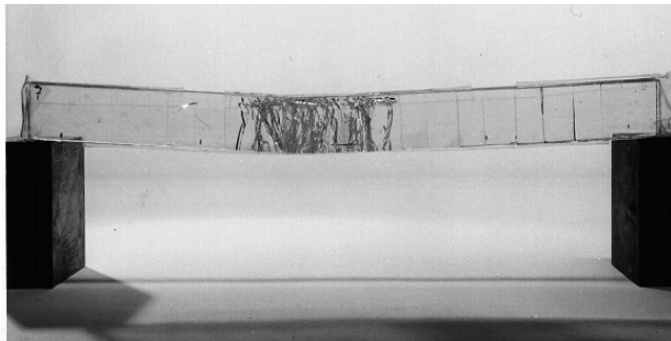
Original Zappi Concept: a 400 mm glass-PC laminate beam, after failure.
